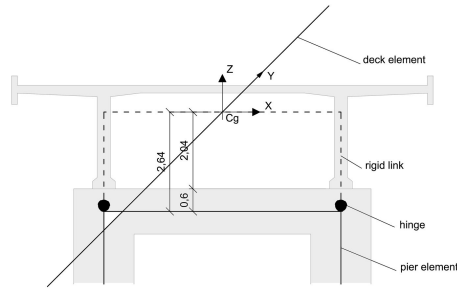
Details of the FE model of the pier-deck connection (dimensions in m)
